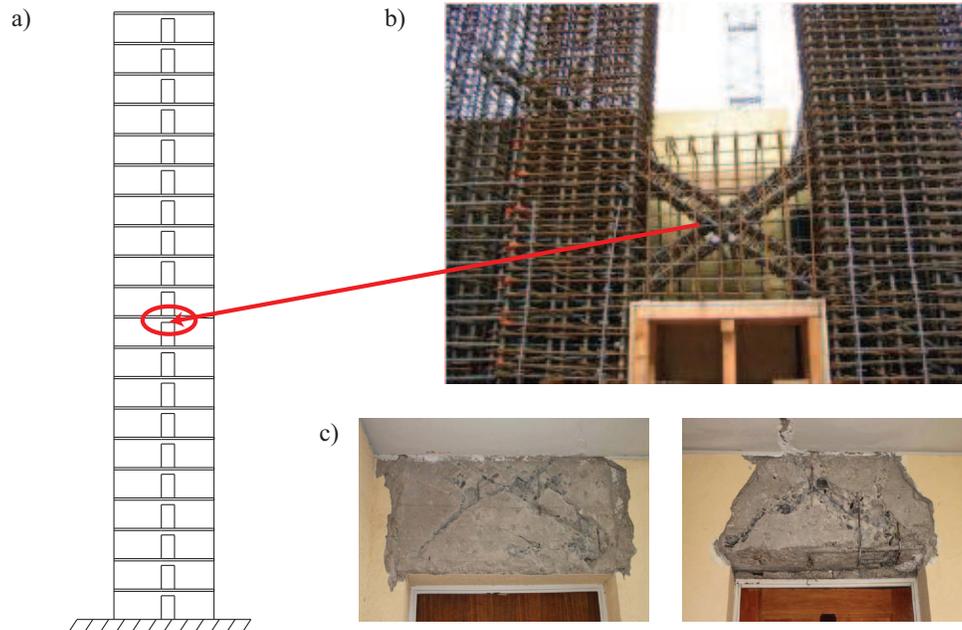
a) Schematic of RC coupled wall structure, b) Typical reinforcing detail for diagonally reinforced coupling beams (Wallace 2006), c) Coupling beam damage in recently-constructed high-rise condominiums after Conception 2010 (LATBSDC 2010)
